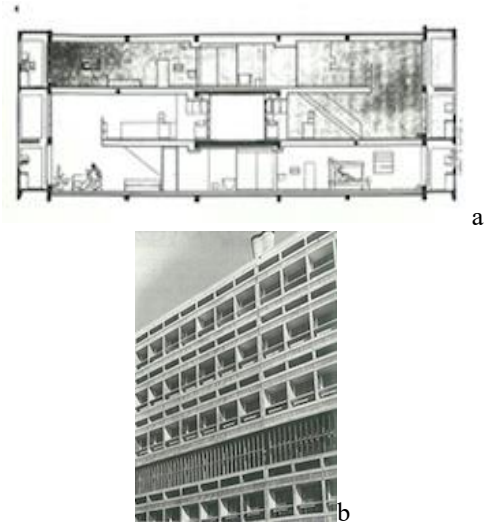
a.Section through the Marseilles block showing sun-breakers in each side, b.Main elevation of Marseilles with vertical brise-soleils on internal Street and horizontal sun-breakers half-way up each double storey apartments,<https://www.architectural-review.com/archive/le-corbusier-in-the-sun>.
